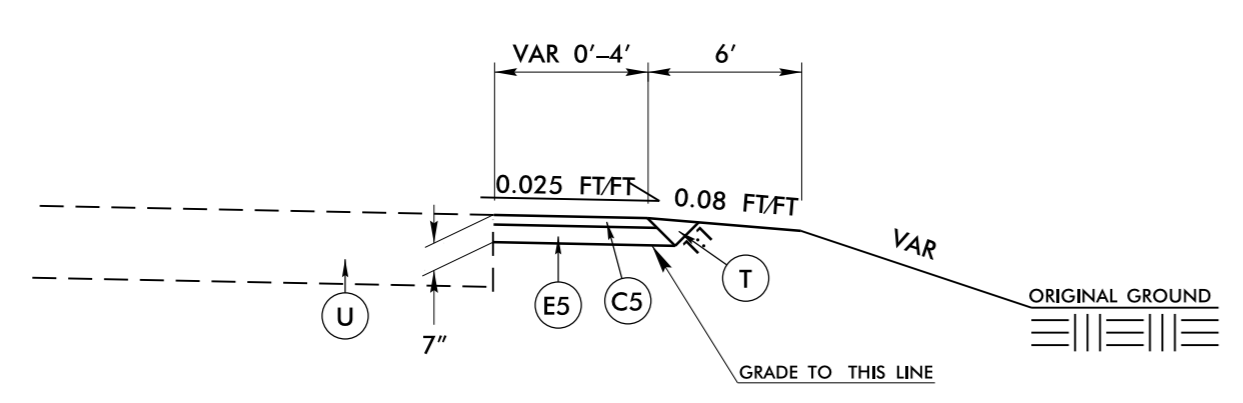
DETAIL SHOWING SHOULDER BERM GUTTER (SBG)
